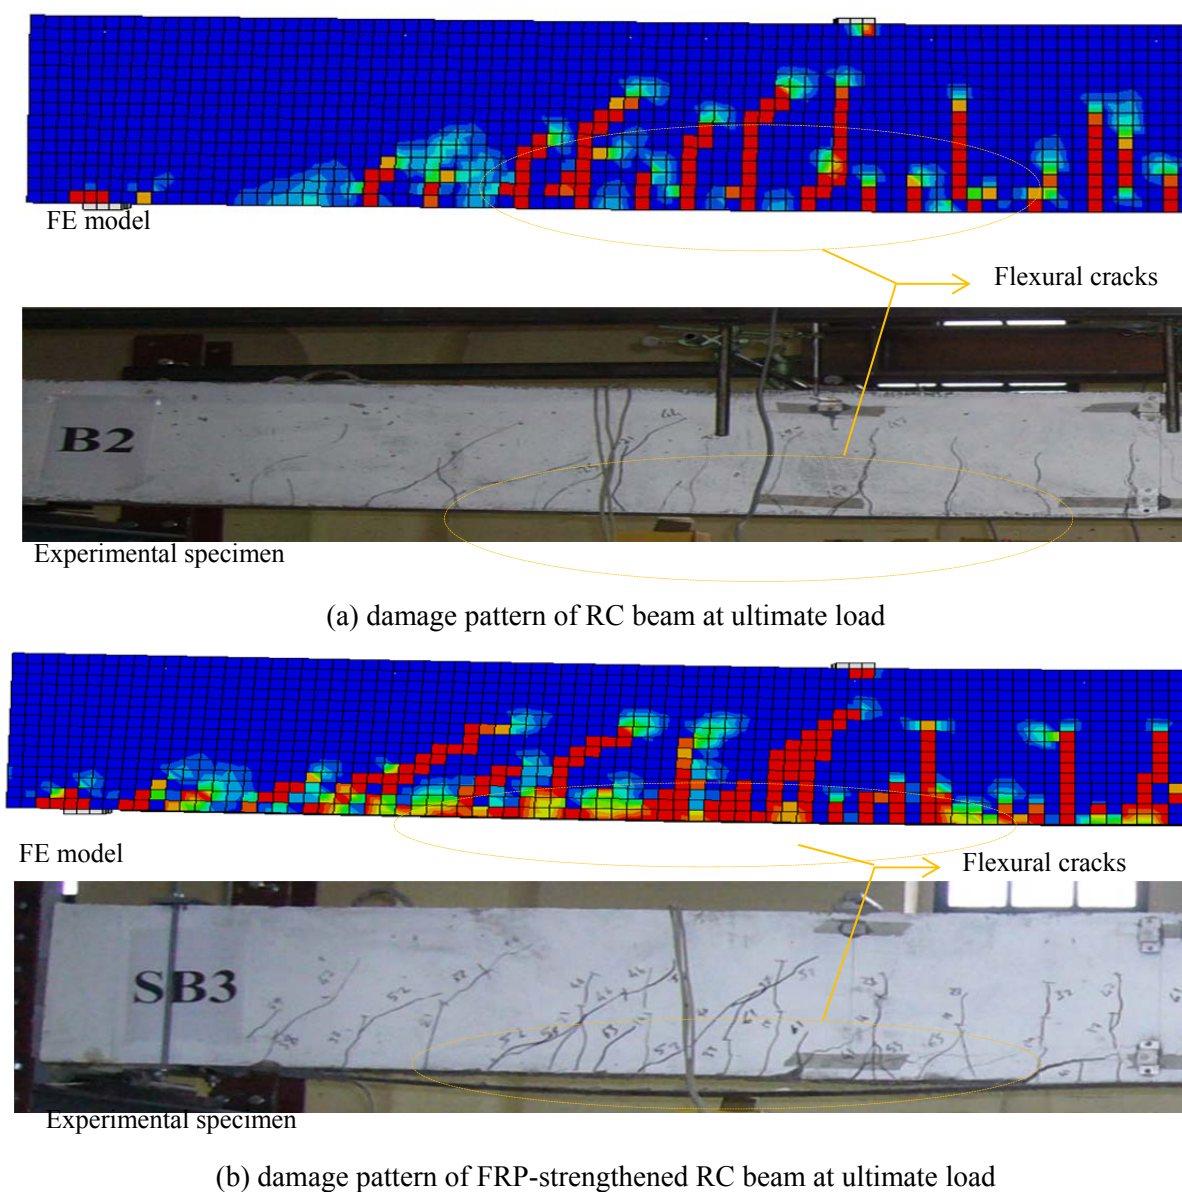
FE crack patterns at ultimate load for (a) control RC beam; and (b) CFRP-strengthened RC beam.
